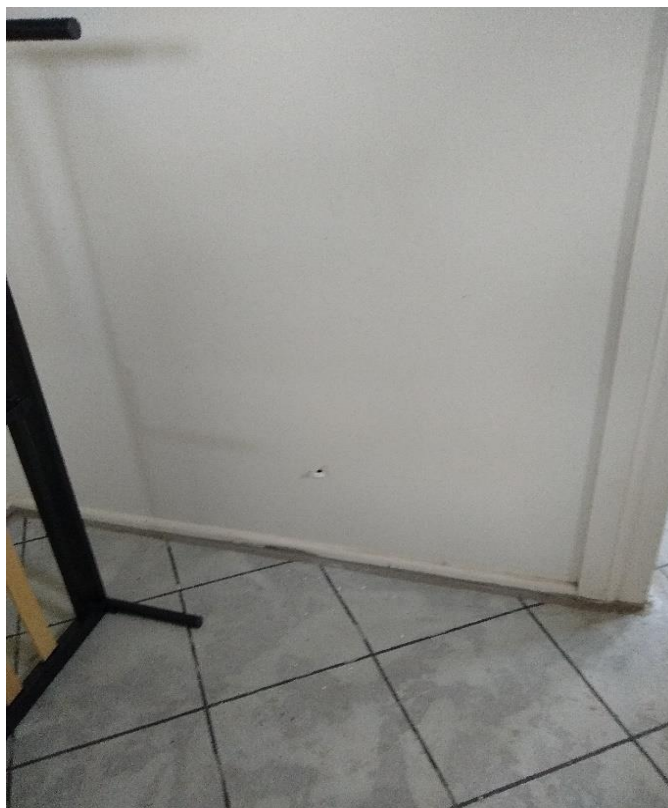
Building 25, interior, wall sheeting in northern bedroom, plaster sheeting, sample 25A1, no asbestos detected by analysis.
